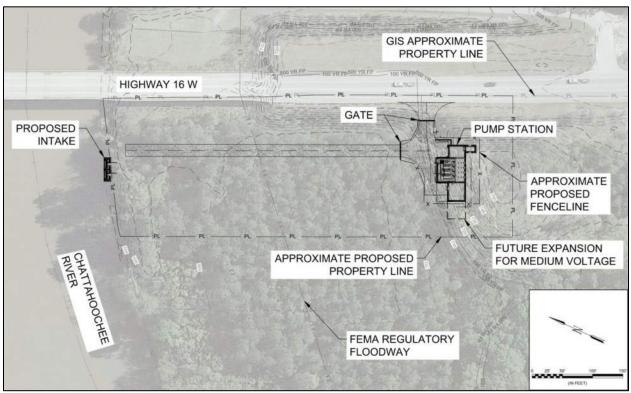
General Site Layout of Intake Structure and Pump Station
